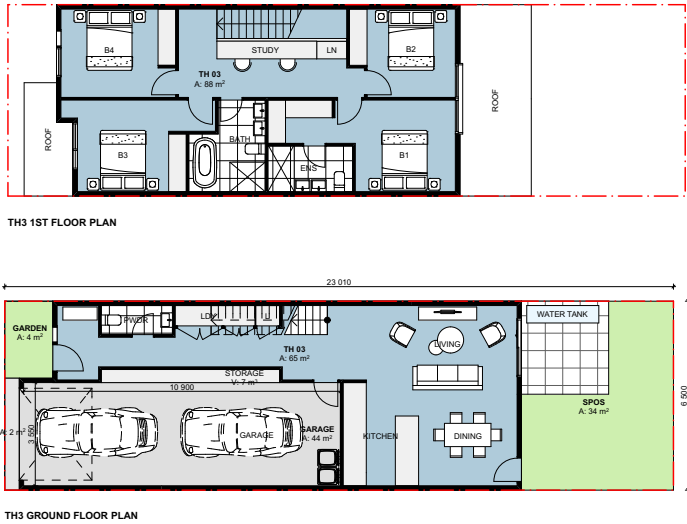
Townhouse Type 03 (Source: Plus Architecture)
